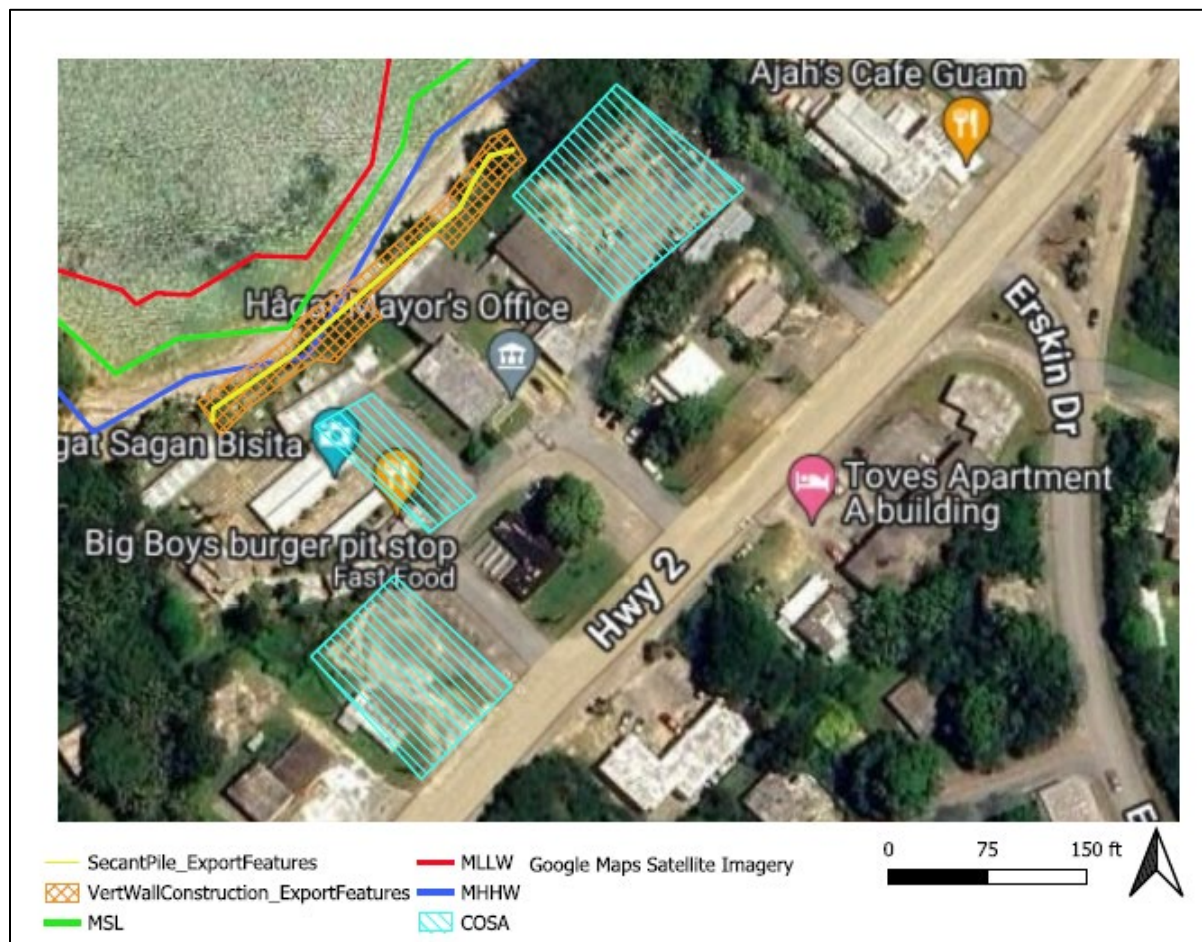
Construction and Staging areas for the Secant Pile Seawall
